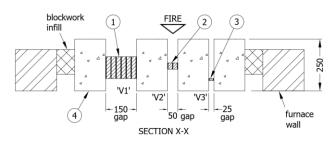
Cross-section of wall linear gap systems F1-F3 – assessment 2 (as shown in WF 148052) – dimensions in mm
